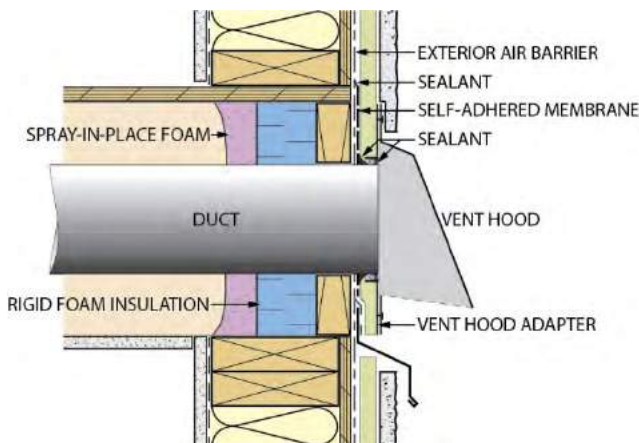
Sample detail of duct penetrating the building's air barrier.
